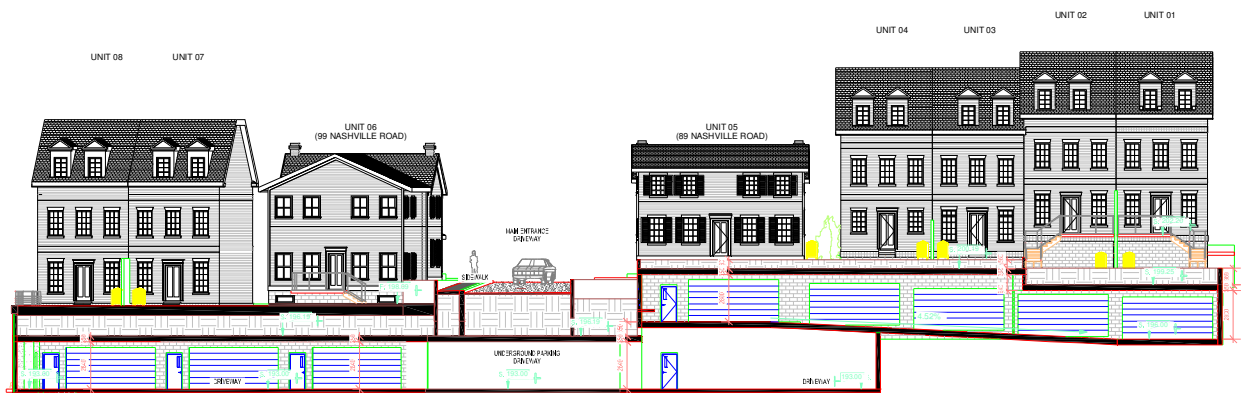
Site Section looking north, taken just behind the Nashville Road houses, showing below-grade parking. The rear additions on the heritage houses are visible here, flanking the driveway entrance.
